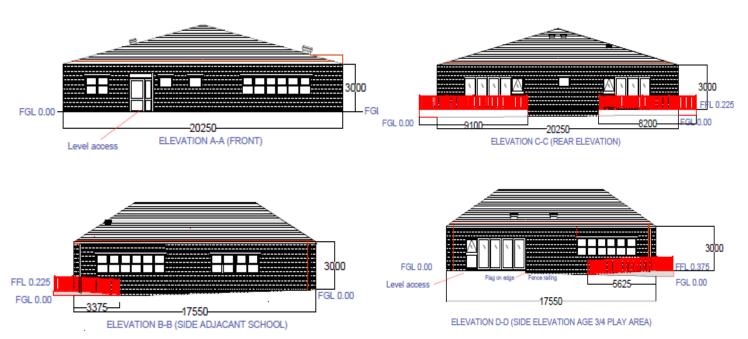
Proposed front (east) and side (south) elevations (left). Proposed rear (west) and side (north) elevations (right).
